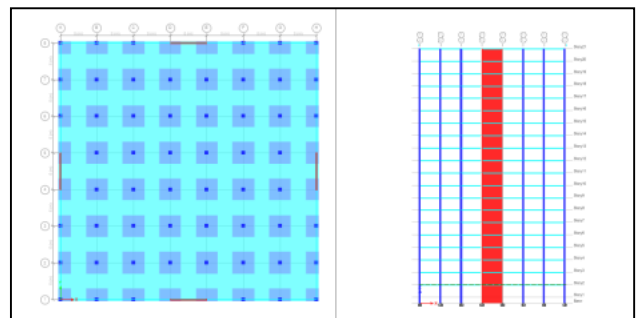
Plan and elevation view of flat slab with shear wall structure
